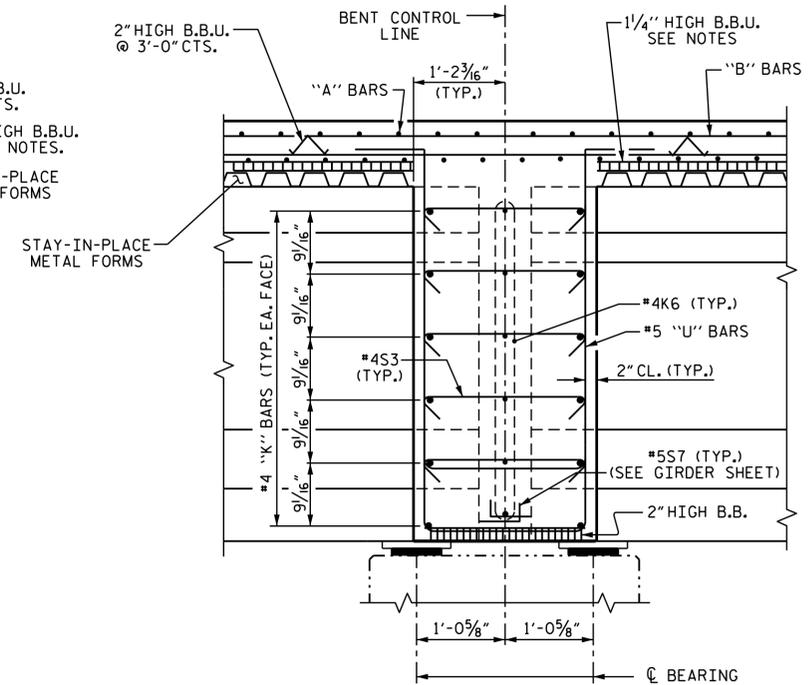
(DETAIL SHOWING "B" BARS IN REBUILD AREA) (SEE "PARTIAL PLAN OF SPAN A" FOR ADDITIONAL DETAILS)
